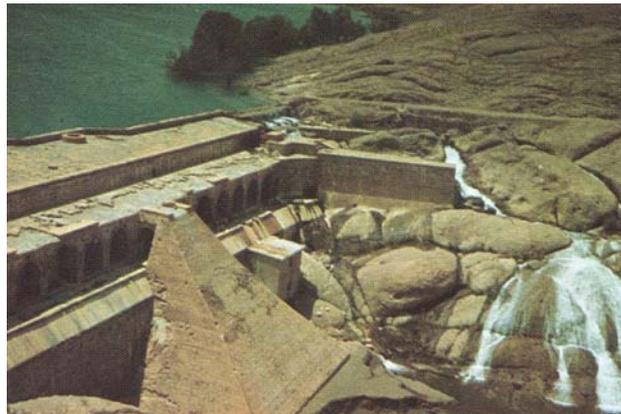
, Fariman Weir and its lowered section for flood to pass through without touching the body of dam
